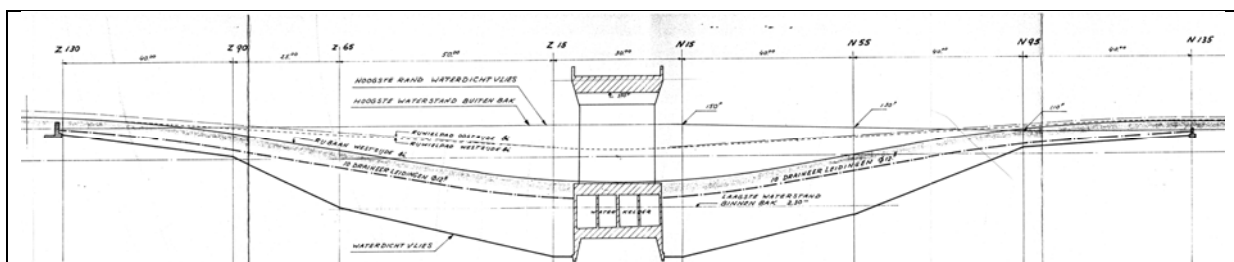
Longitudinal section railway underpass, access roads constructed with a geomembrane barrier system ballasted with backfill, in the middle a concrete construction with 4 track railway [Technical drawing, Dutch Railway Institute, 1968].
